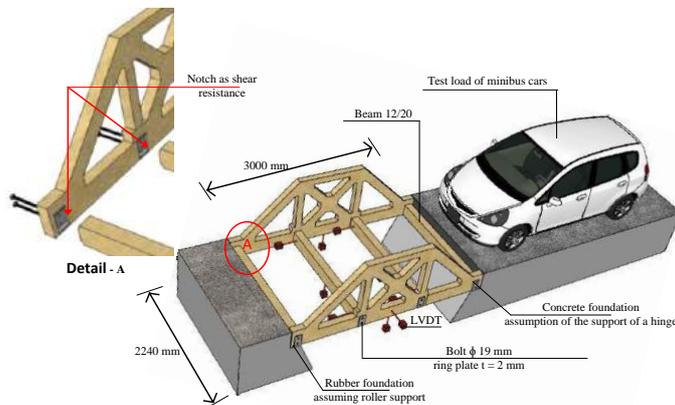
Arrangement of the testing of the bamboo-reinforced concrete frame precast bridges.
